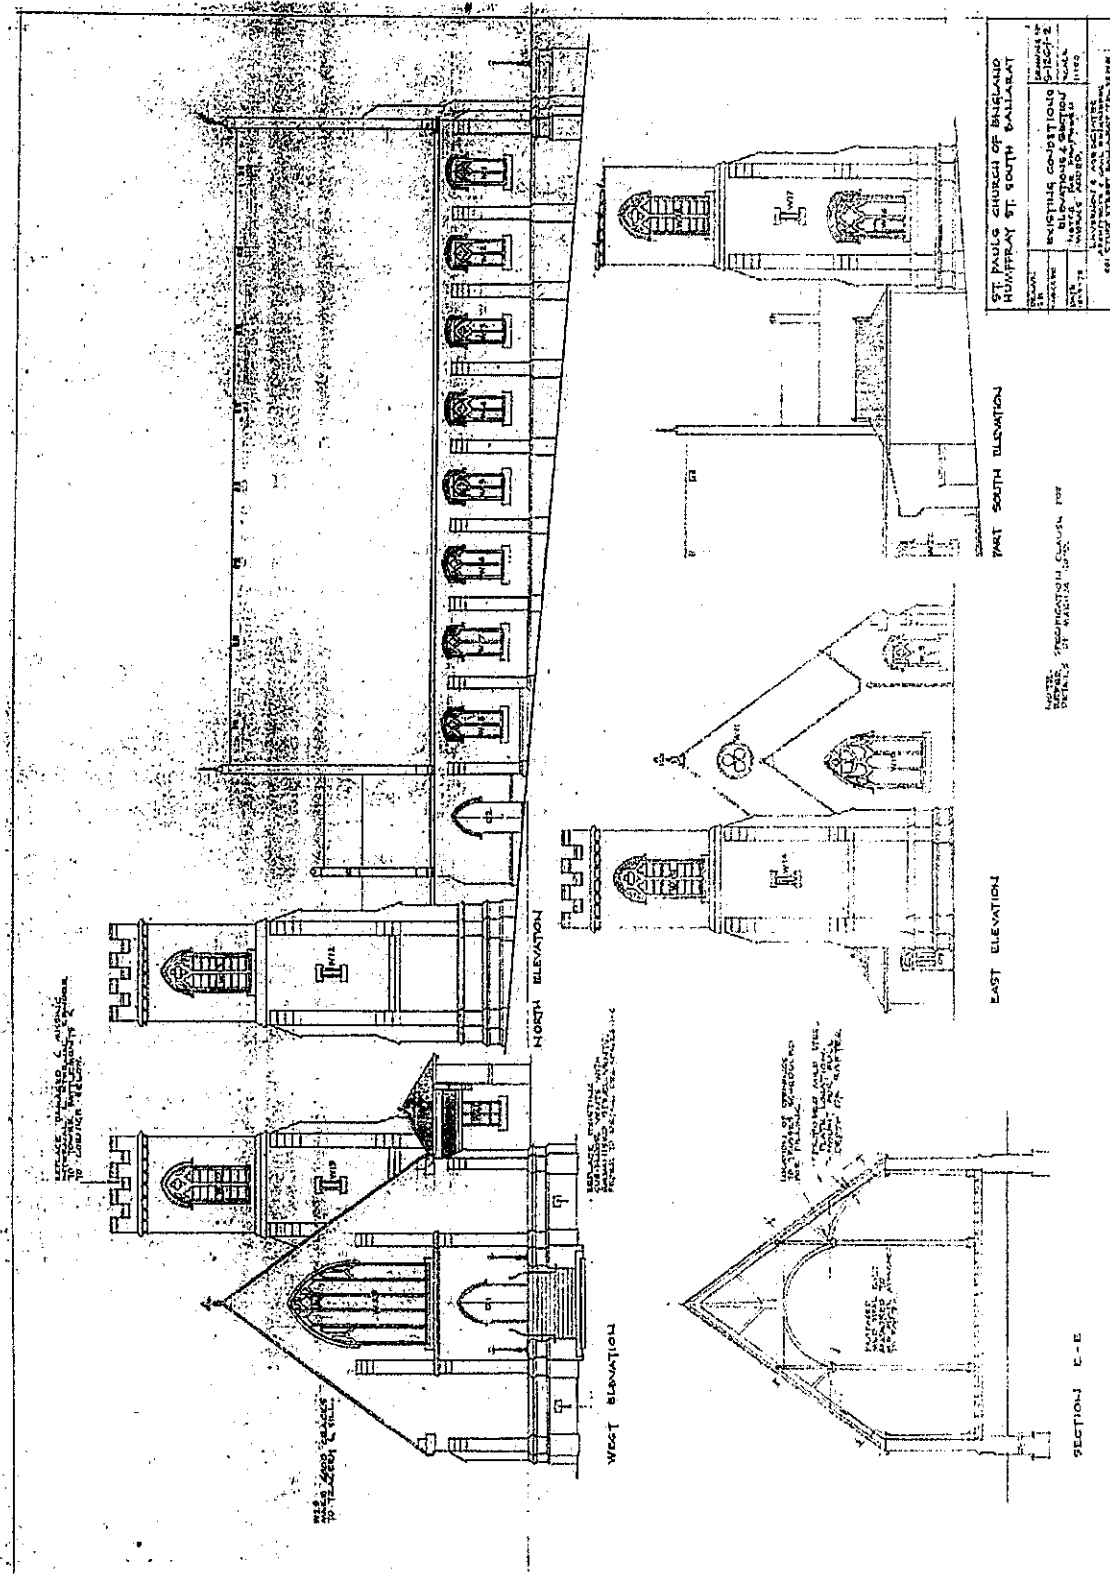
St. Paul's Church Existing Conditions Elevation & Section Drawings by L.H. Vernon & Associates, 16 August 1978. Source: St. Paul's Anglican Church.
